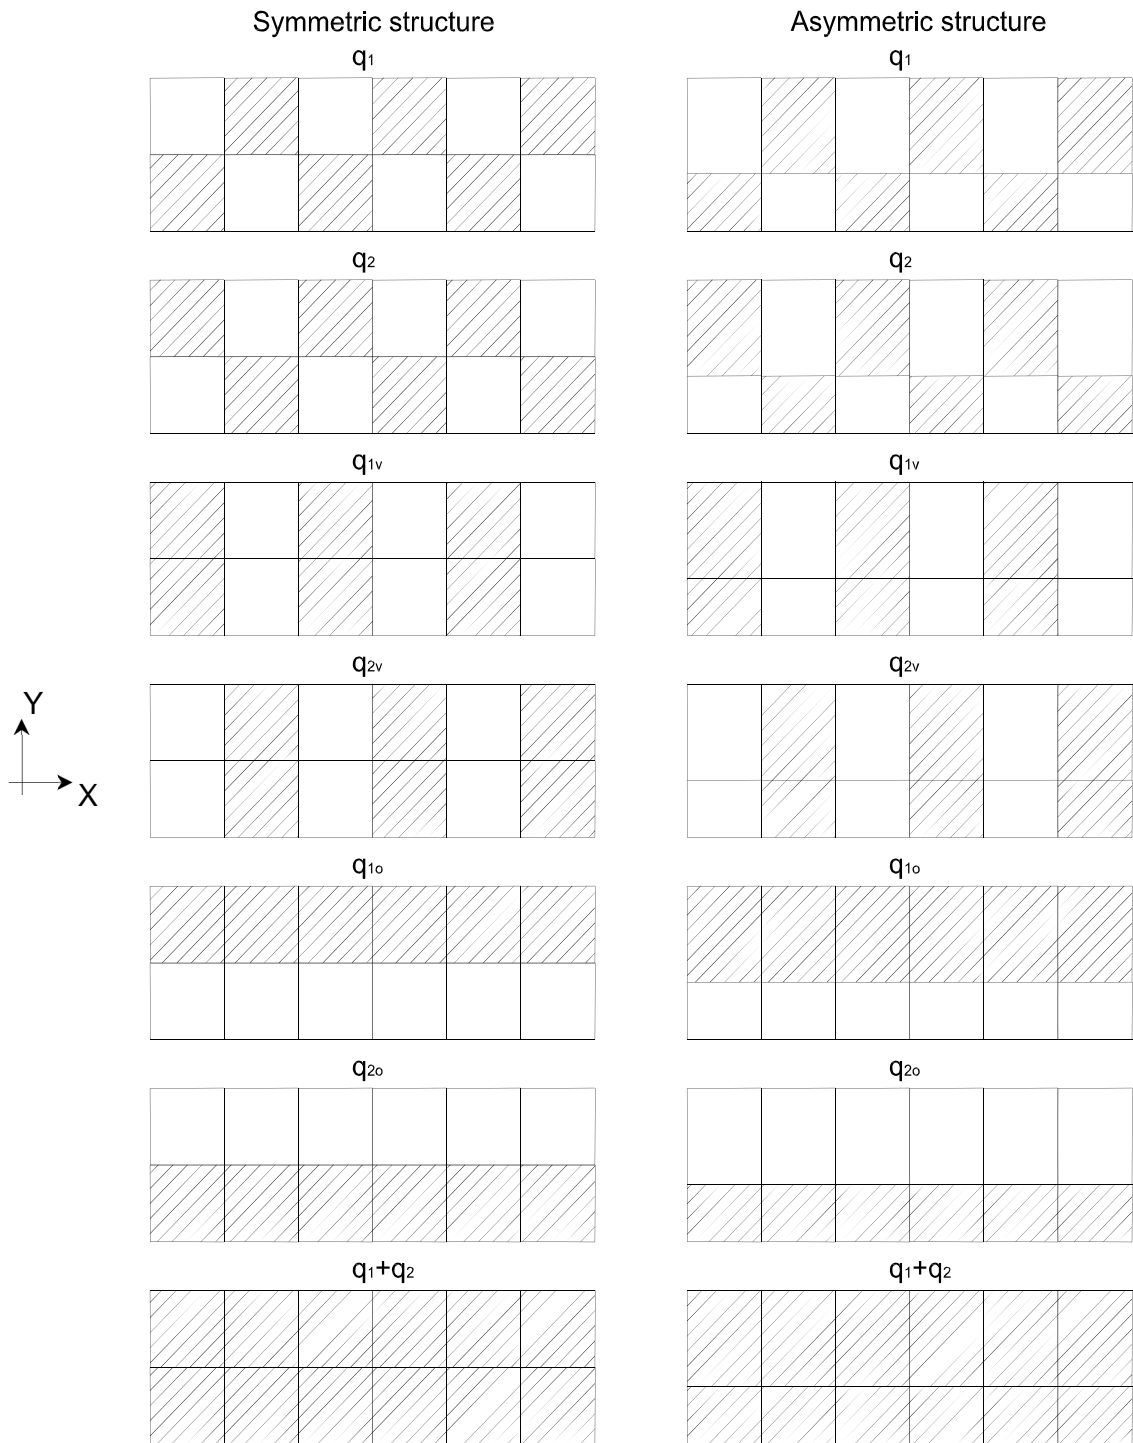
Load Combination Schemes on the Typical Floor Framing Plan
